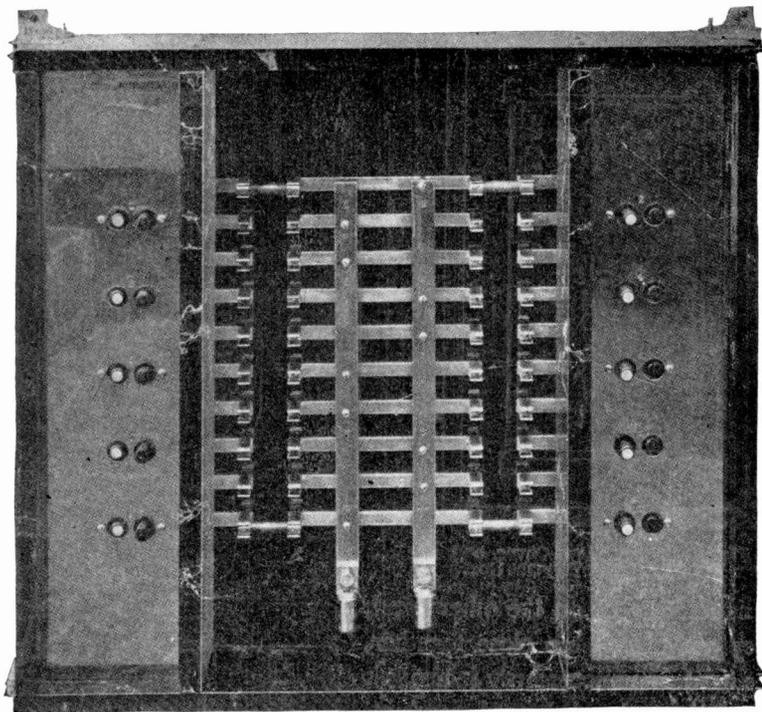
Cut-Out Panel with Push-Button Switches. Cover Removed.
